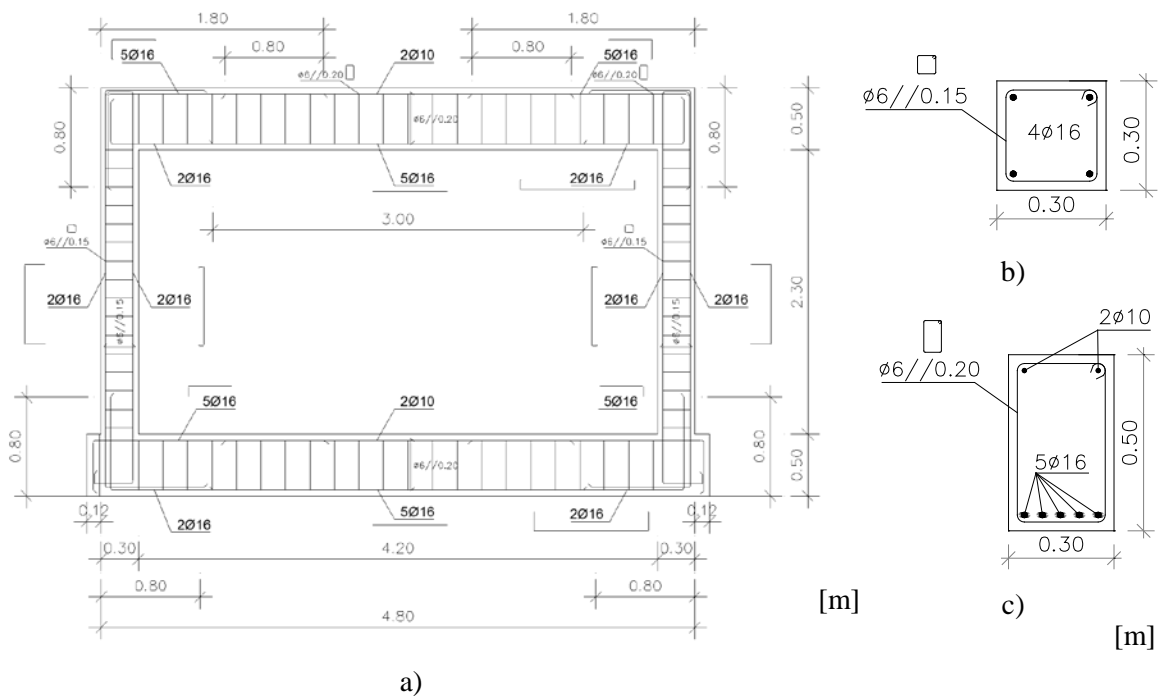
Infilled RC frame specimen dimensions (in meters): a) General dimensions; b) column; and c) beam dimensions and reinforcement detailing.
